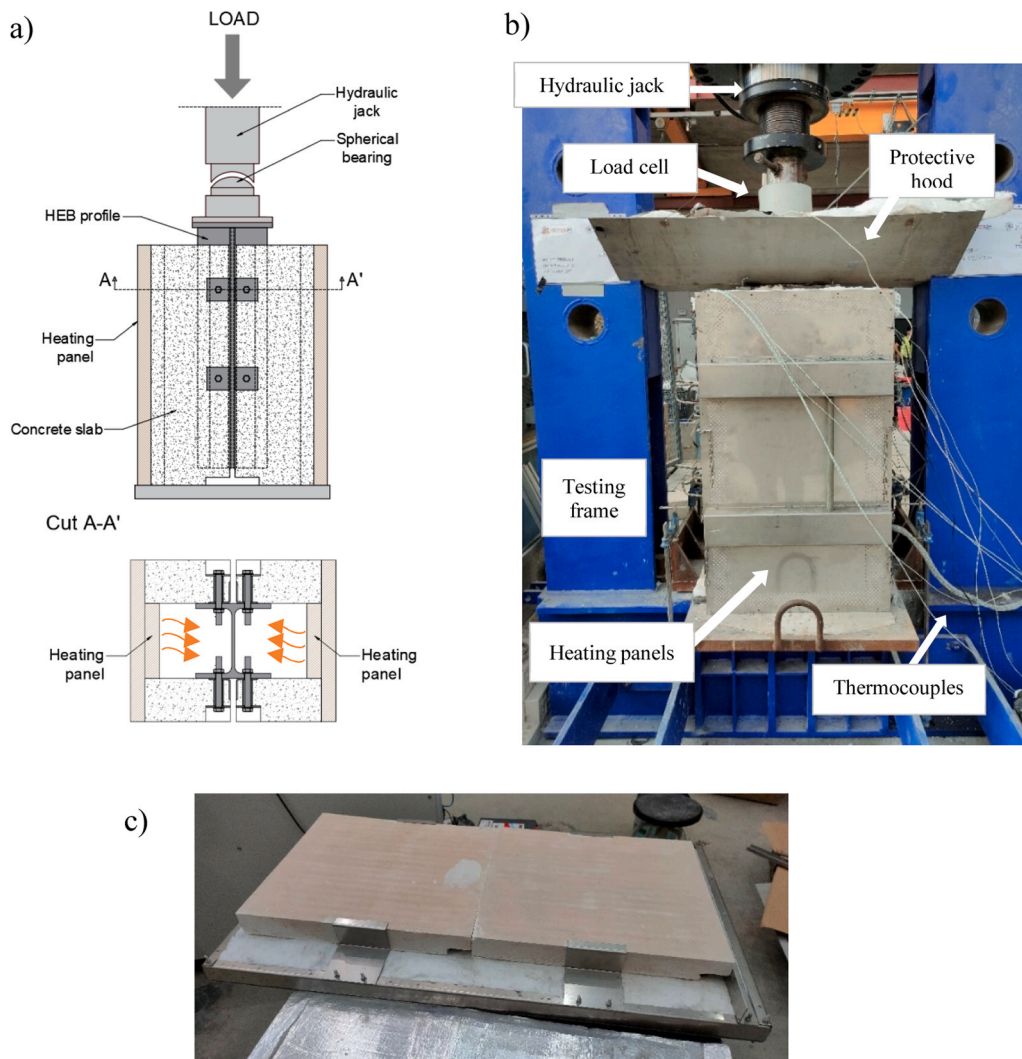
Setup for the elevated temperature push-out tests: a) schematic view; b) front view; c) detail of a heating panel.
